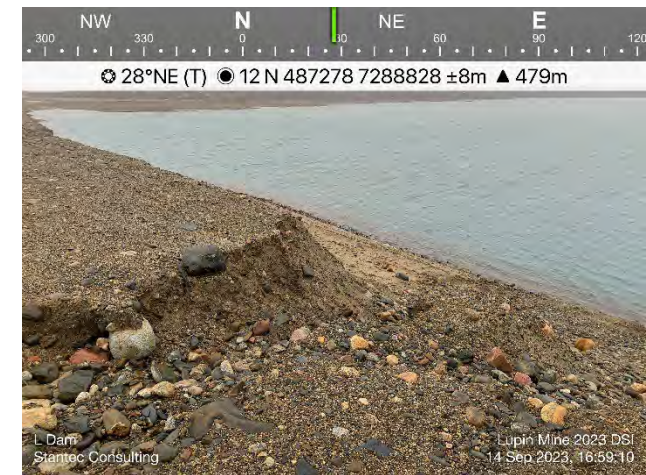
Existing erosional feature near the crest and on the downstream embankment at L Dam.
